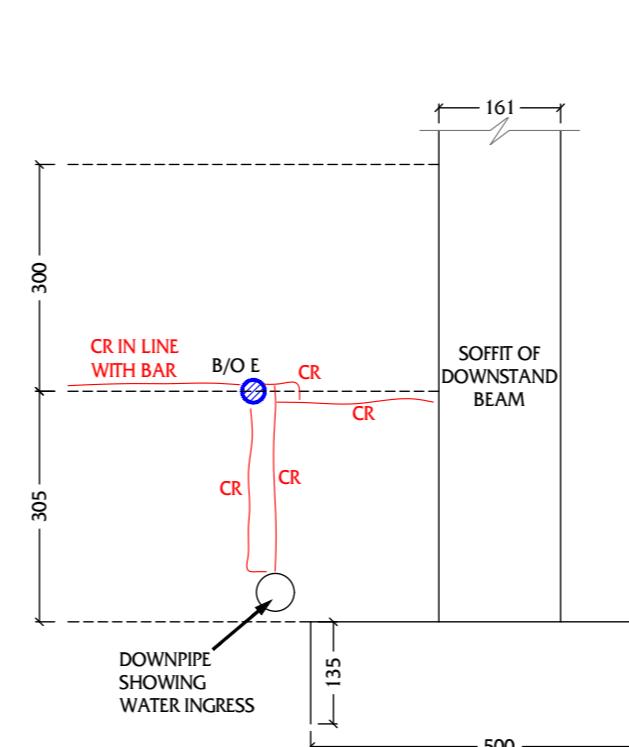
PART SECTION LOOKING EAST THROUGH ROOF SLAB SHOWING DETAILS OF PRECAST CONCRETE PLANK - SURVEY AREA RS4 SCALE 1:5
